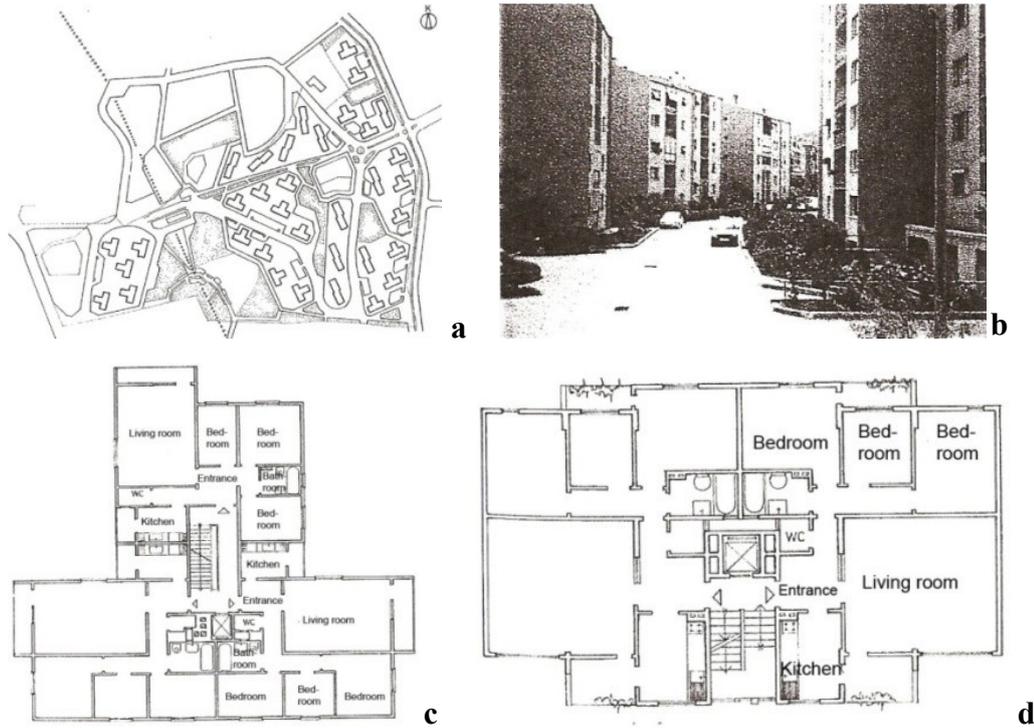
OYAK Mass-Housing, Izmir, 1979-1987: a. Site plan; b. A view from the street; c. Floor plan of the A-type housing; d. Floor plan of the B-type housing (Source: Koç 2001, 139, 140)
